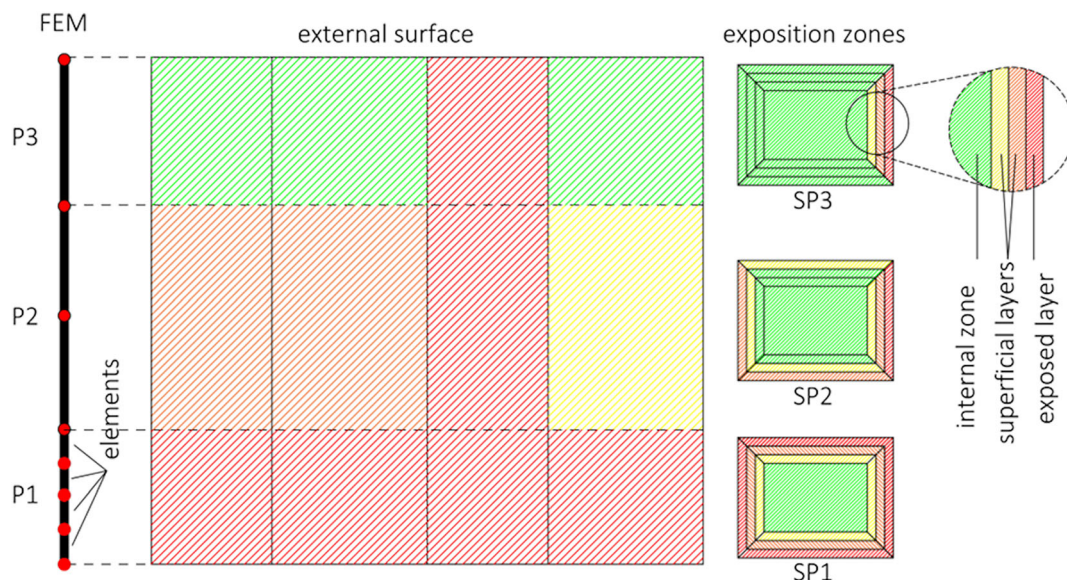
Illustrative example of a deterioration scenario for a single-column pier with solid rectangular section.
